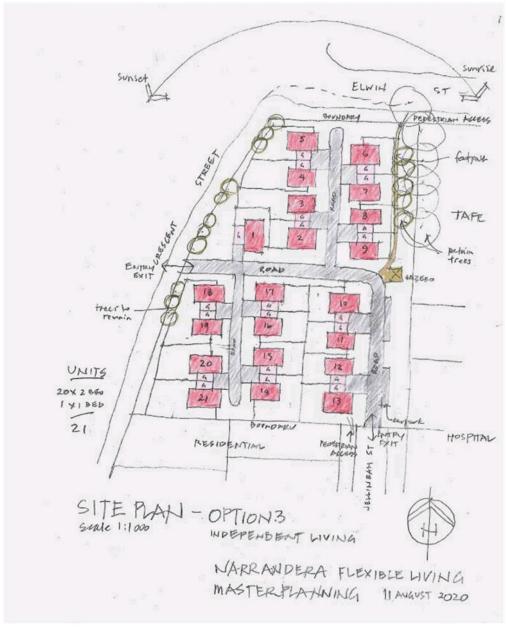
MASTERPLAN DESIGN CONCEPT - OPTION 3
